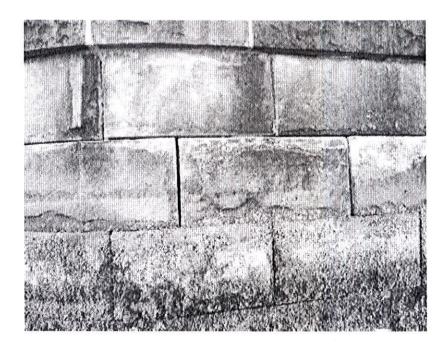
Photo 61 Appendix D Pier 7 Mortar Loss Above and in the Tidal Zone
